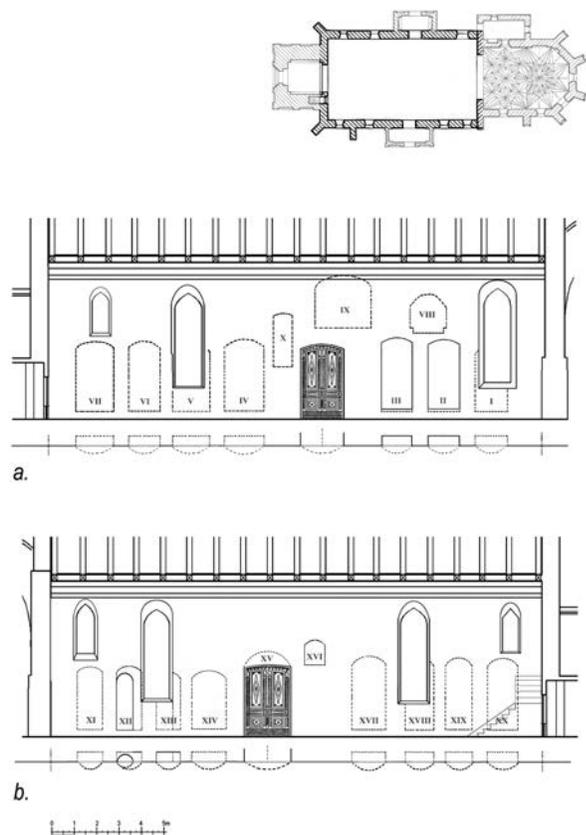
Recesses in the church walls: a) south wall, b) north wall (drawn by M.R. Gogolin, J.M. Arszczyńska)
